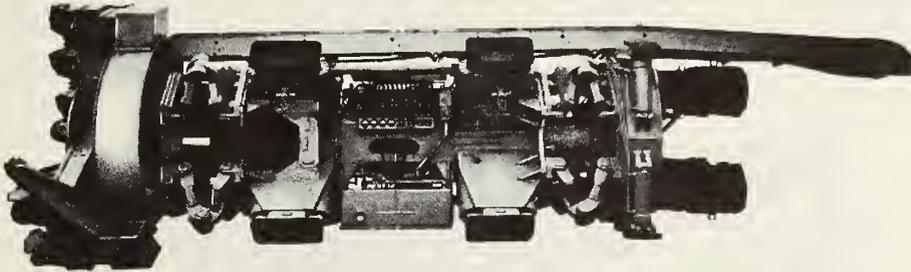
Tunneling machine with slip safety attached to box of combination gear
